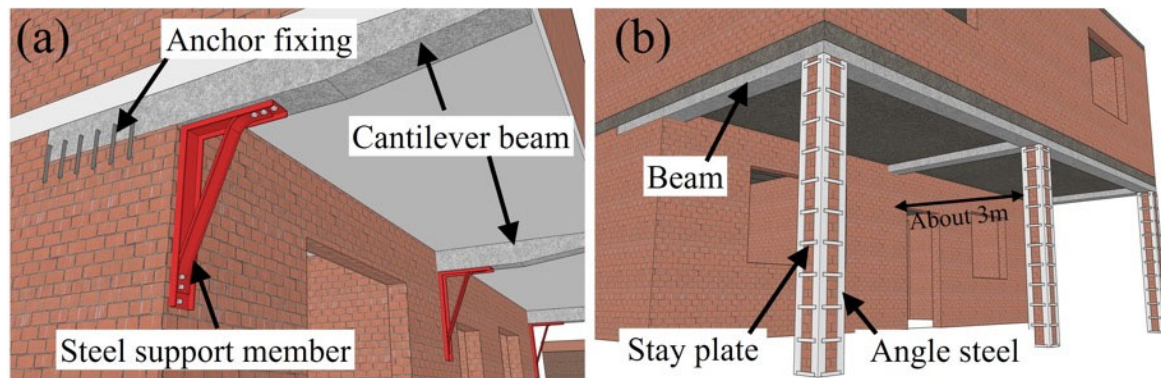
Reinforcement of vertically irregular masonry structures. (a) Enhancing the support capacity of cantilever structures using triangular steel braces. (b) Enhancing the load-bearing capacity of brick columns using encased steel sections.
